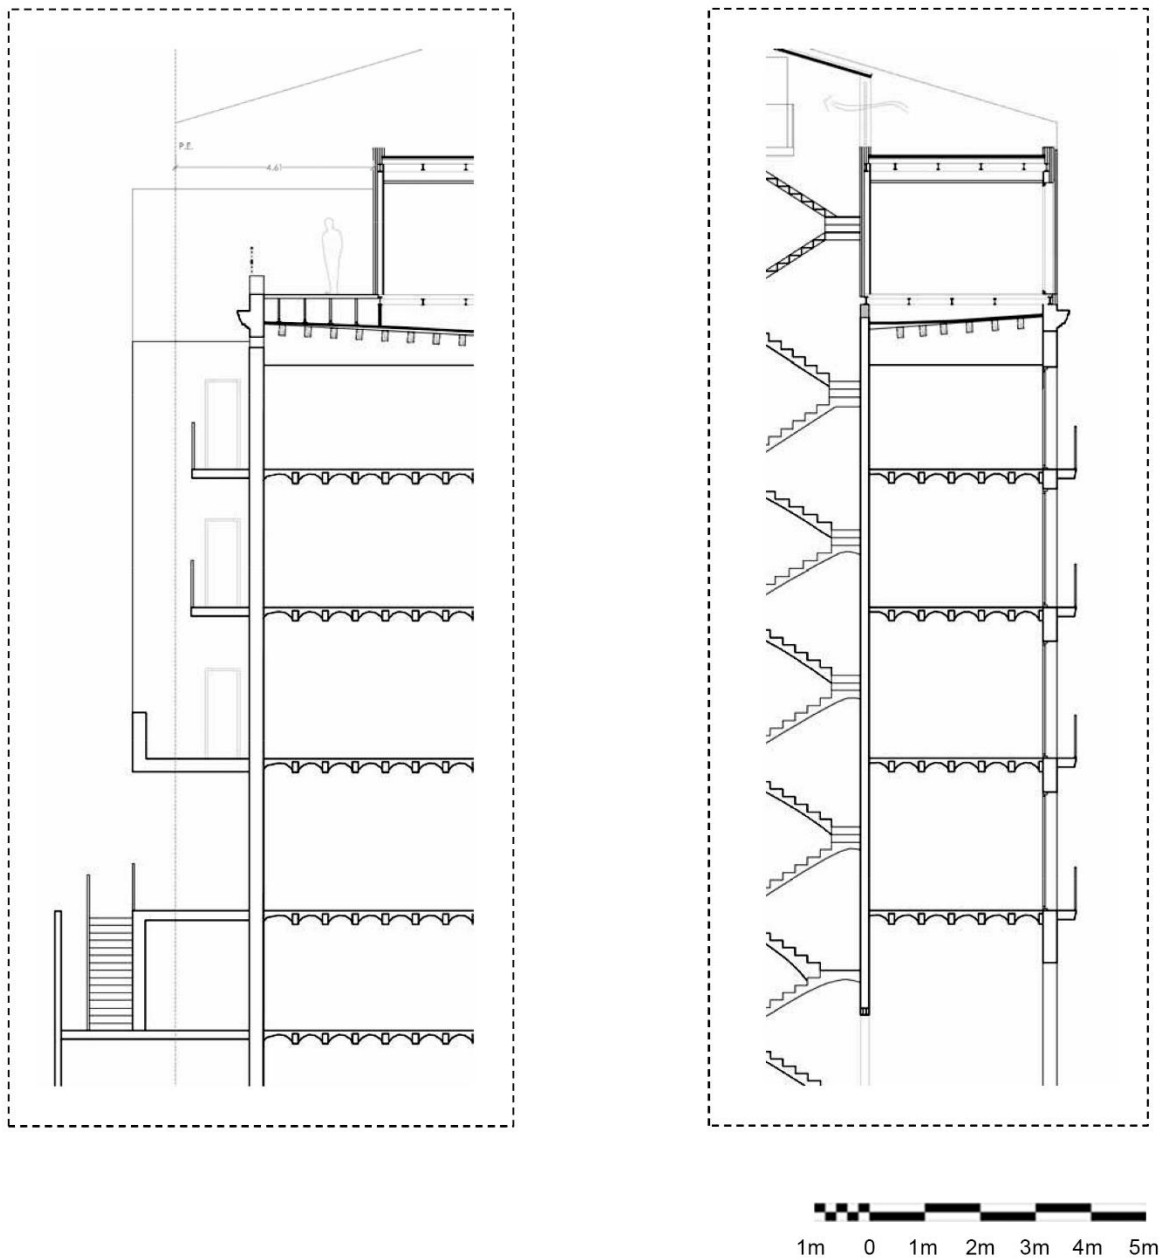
Left: Rear façade cross section. Right Frontal façade cross section. Source: Casa Ático (Dossier Girona 81, 2015)
